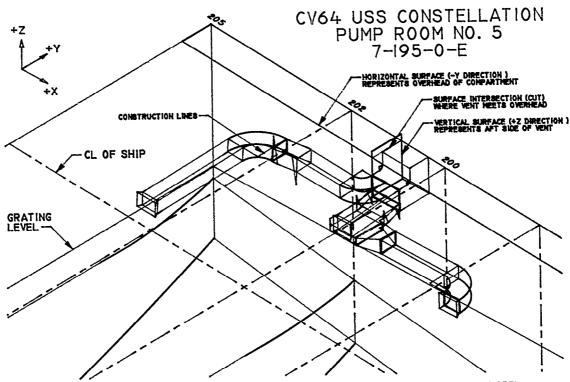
SURFACES AND CONSTRUCTION LINES USED TO RECONSTRUCT VENT IN 3-D MODEL
